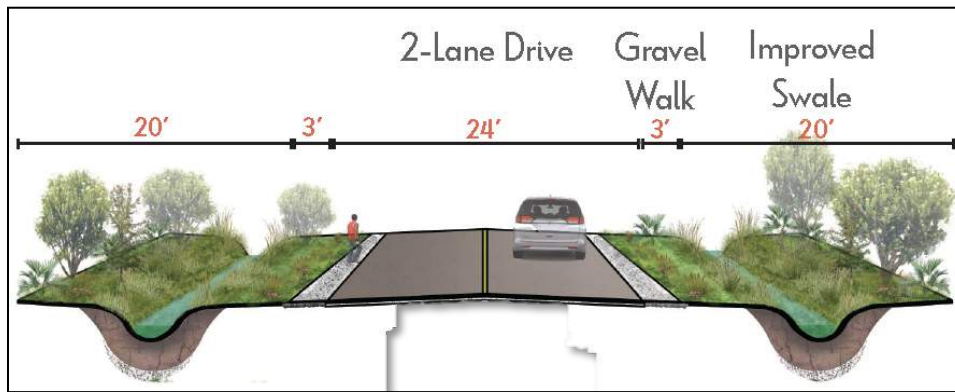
Typical Roadway Section in the T-3 Sub-Urban Transect zone. Source: Grant Huber.
